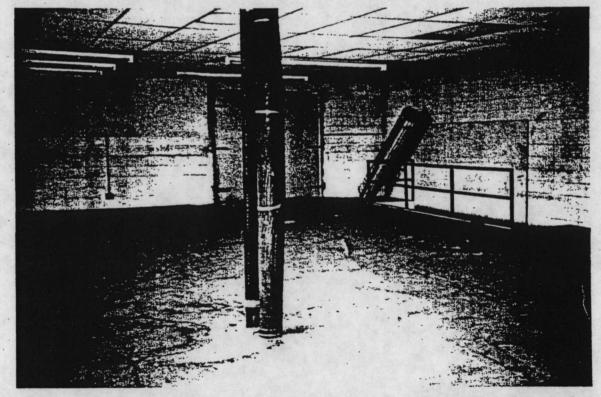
Sheet flooring at 2nd floor warehouse contains asbestos.
